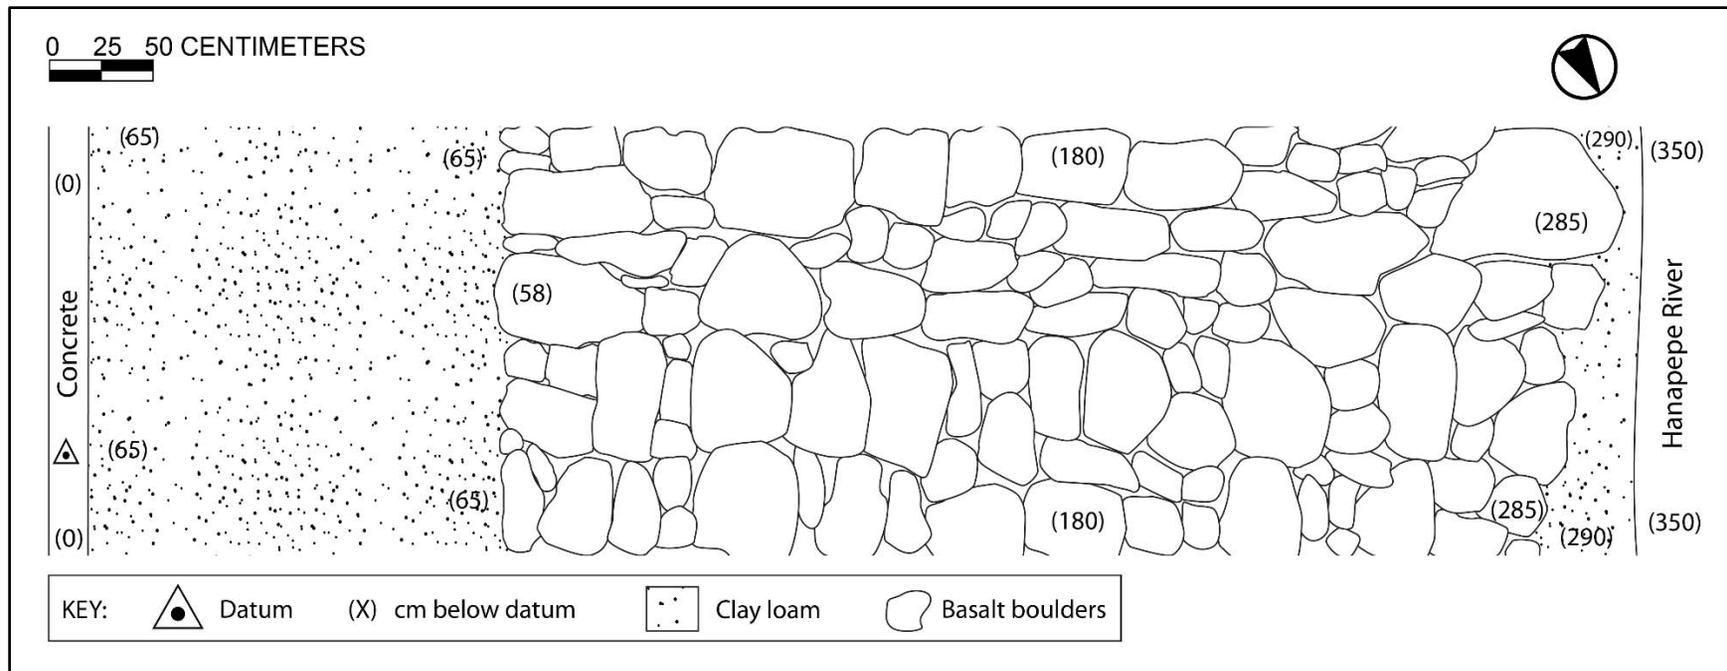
Plan map of a cross-section of SIHP # -2283, floodwall, between Kaumuali'i Highway and Hana Road
